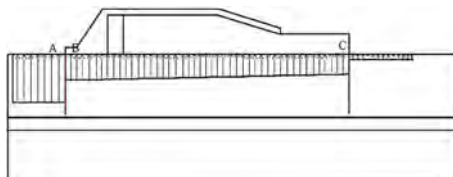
Typical sketch showing uplift pressure variation at the base of the footing.
